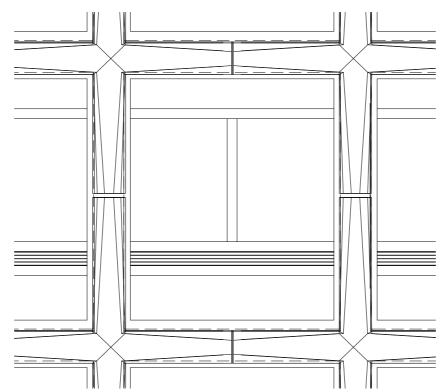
Proposed Tower Fixed Window Unit
